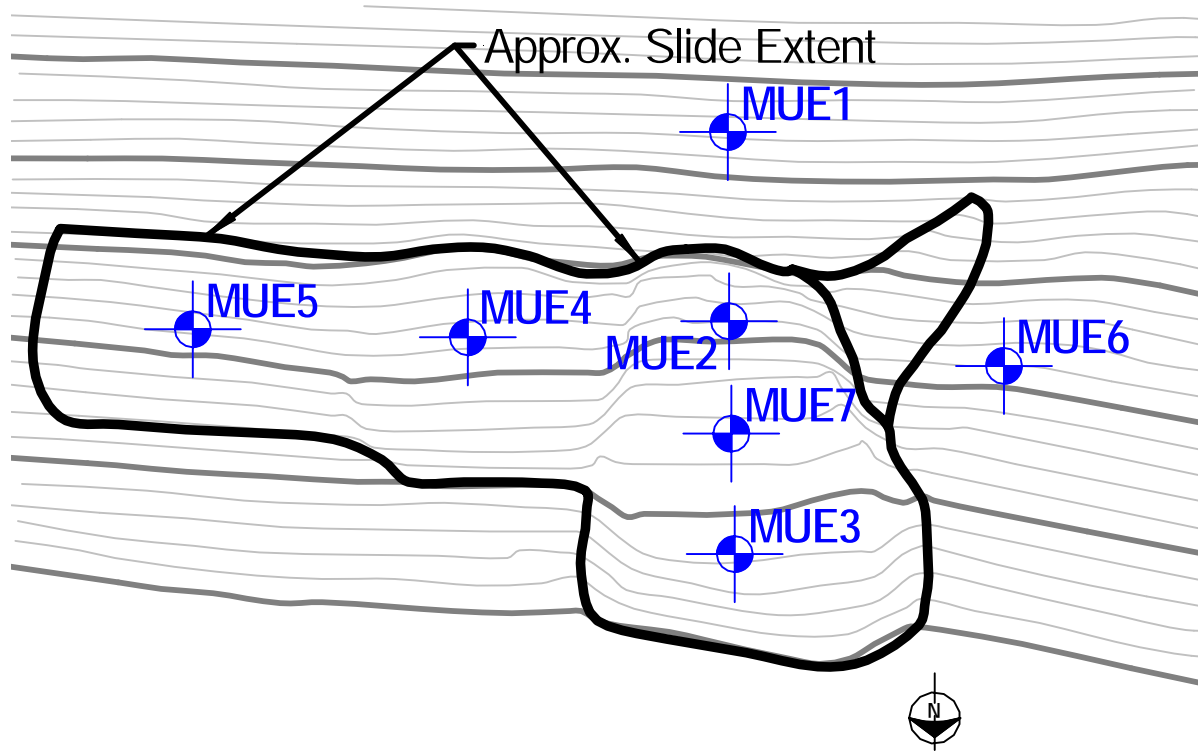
Plan view of I435-Wornall Road site showing approximate boring locations.
